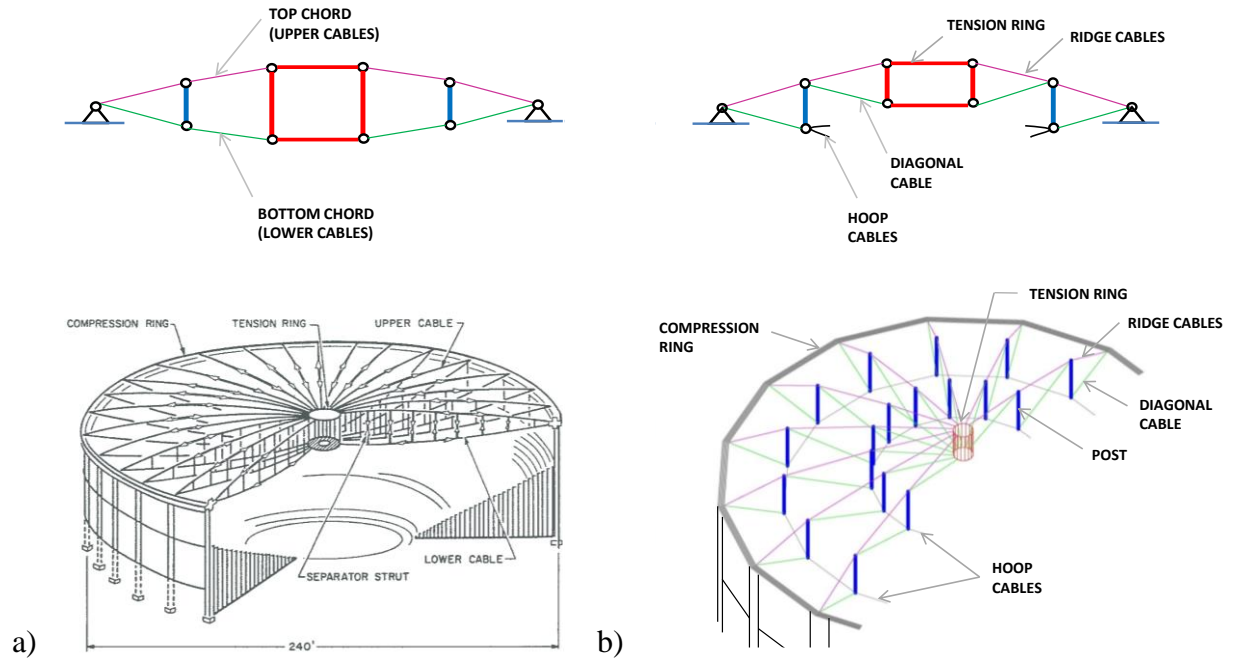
(a) Typical cable truss (Utica Auditorium); and (b) Typical cable dome system
